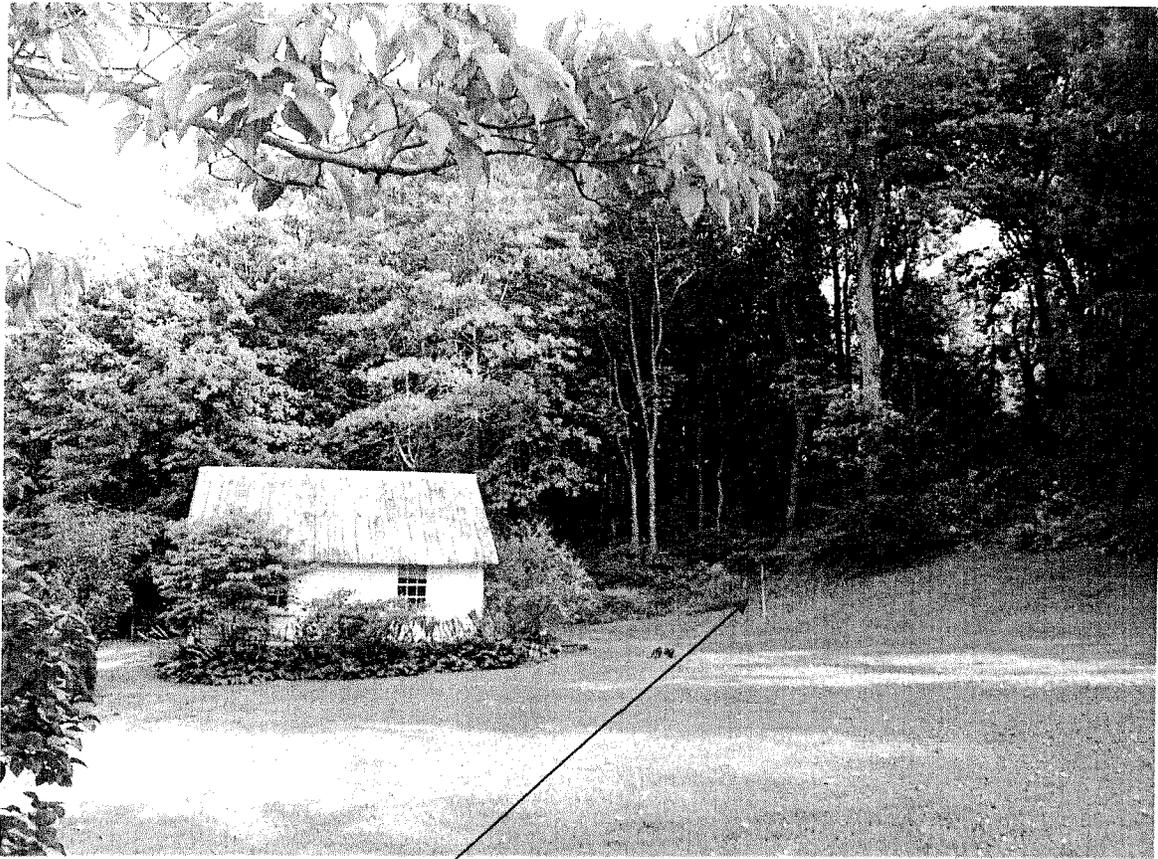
Existing garage and @ 70' setback stake (Facing Southeast) 1
